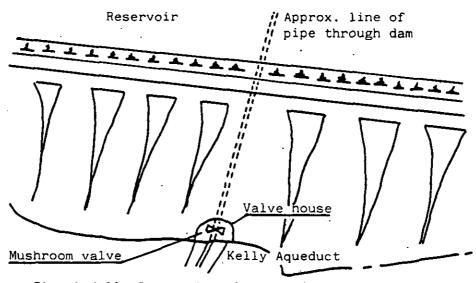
Kelly Reservoir. Layout of Original Pipework
